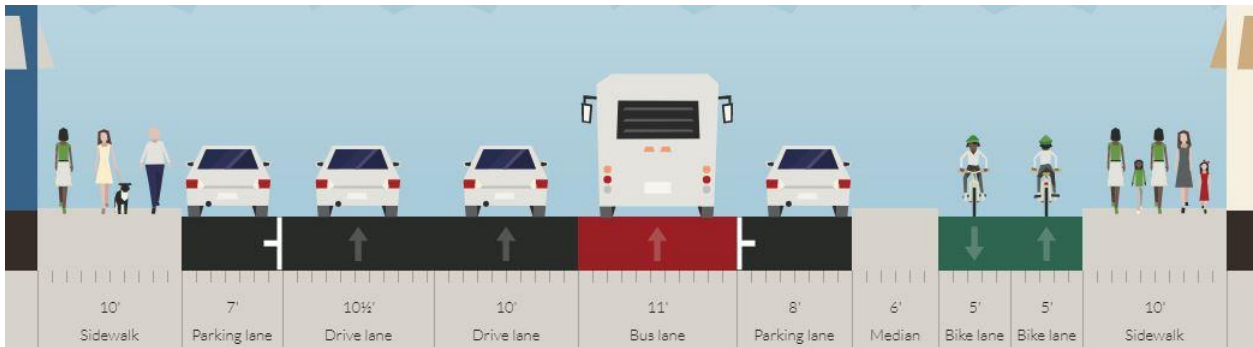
Typical Cross Section of Folsom Street from 5th Street and between 5th and 4th streets
